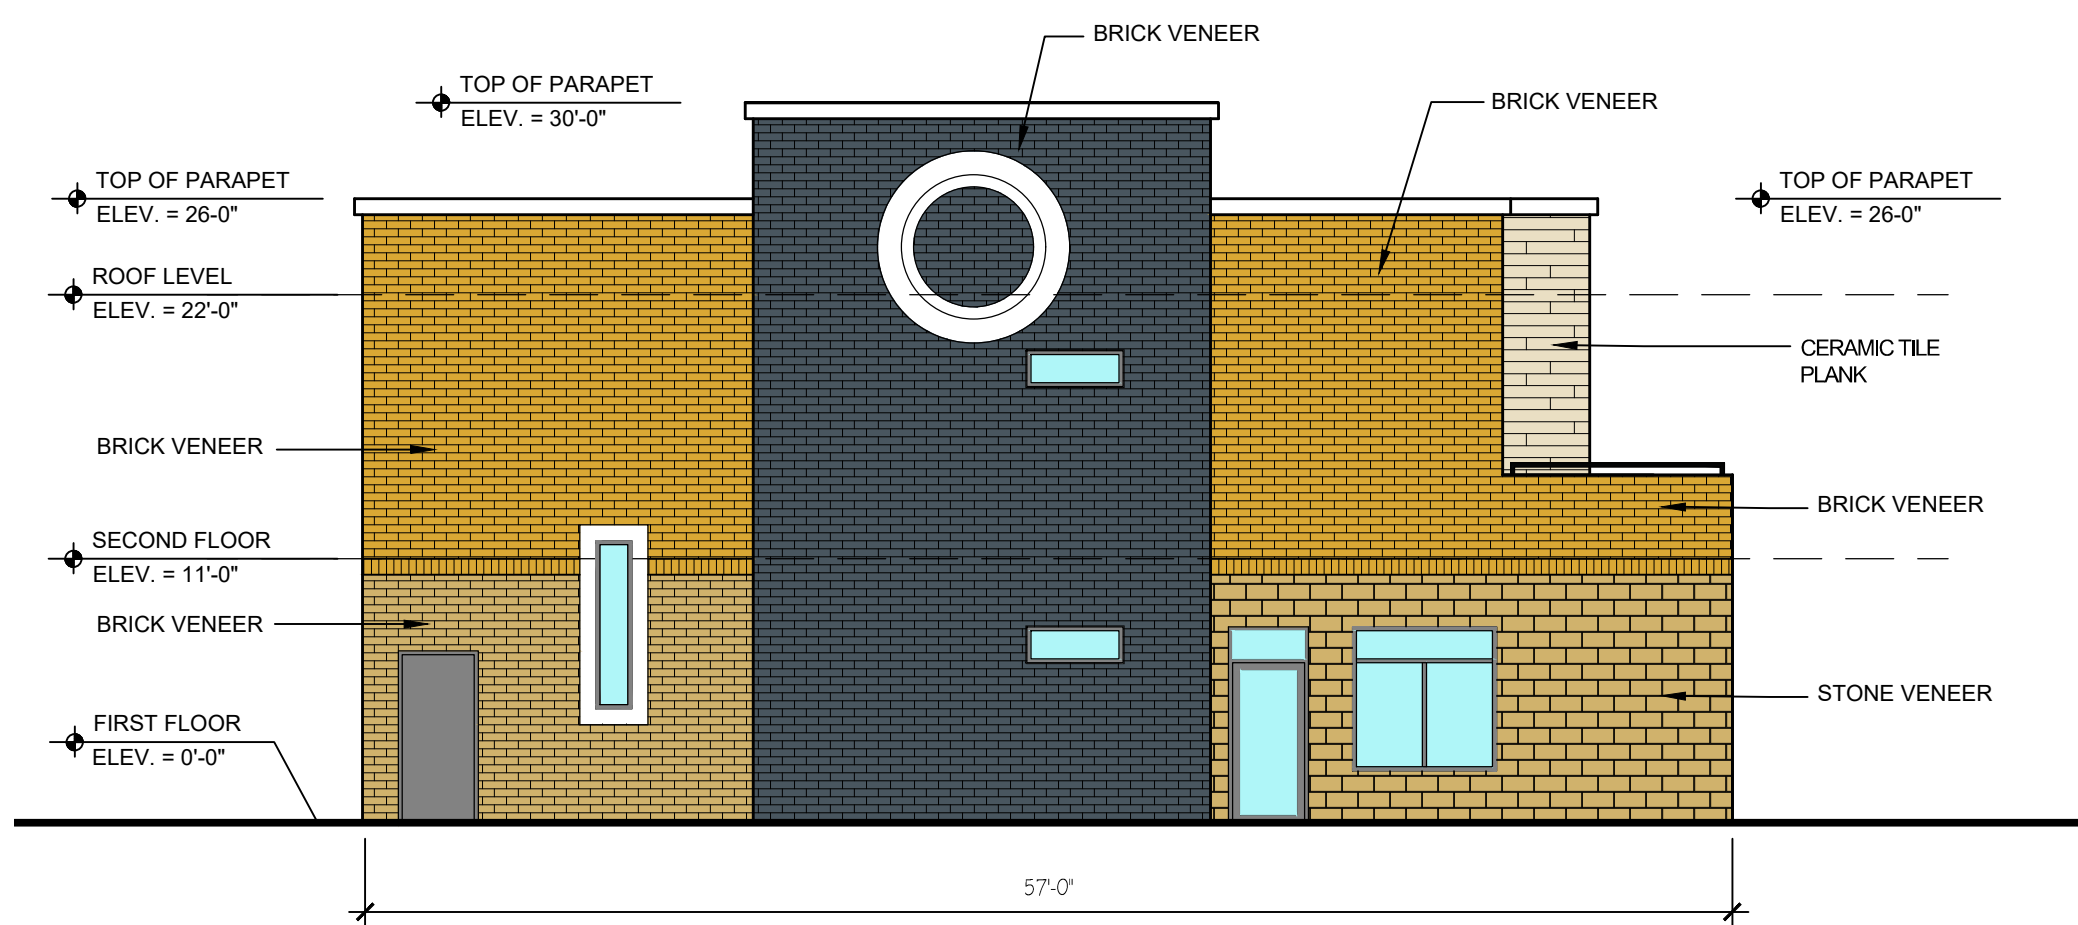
EXHIBIT D: CONCEPTUAL PLAN PROSPER CENTRAL ADDITION BLOCK 1, LOT 1 ZONE-23-0029
